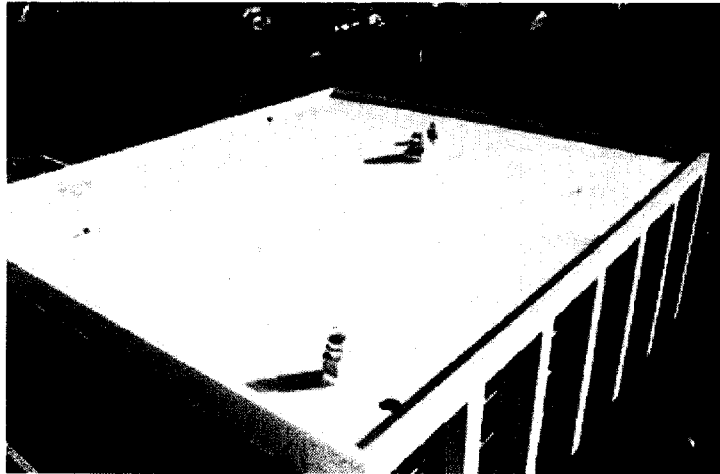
Illustration of PVC Roofing system for commercial application
